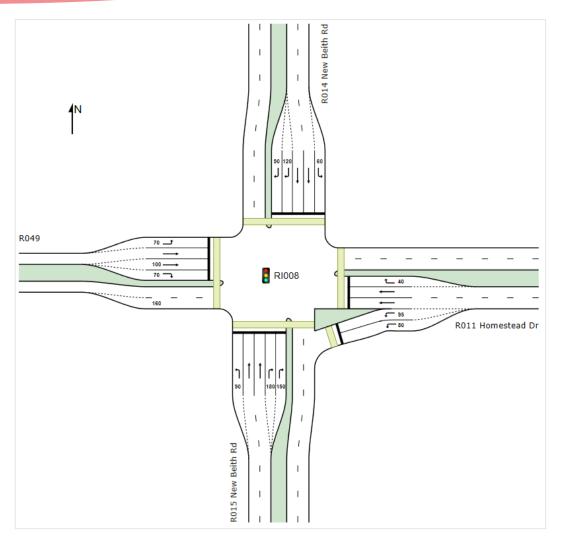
Intersection 3 SIDRA Intersection Layout
